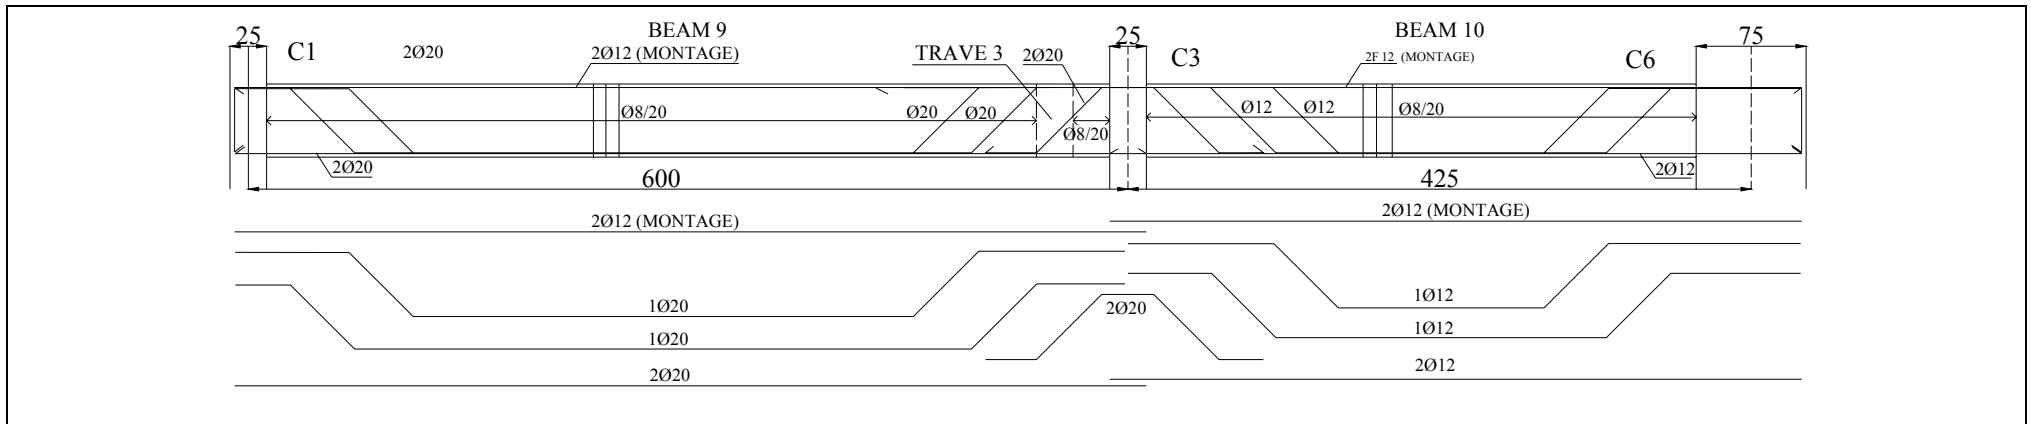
Beam 9 and beam 10 longitudinal reinforcement
